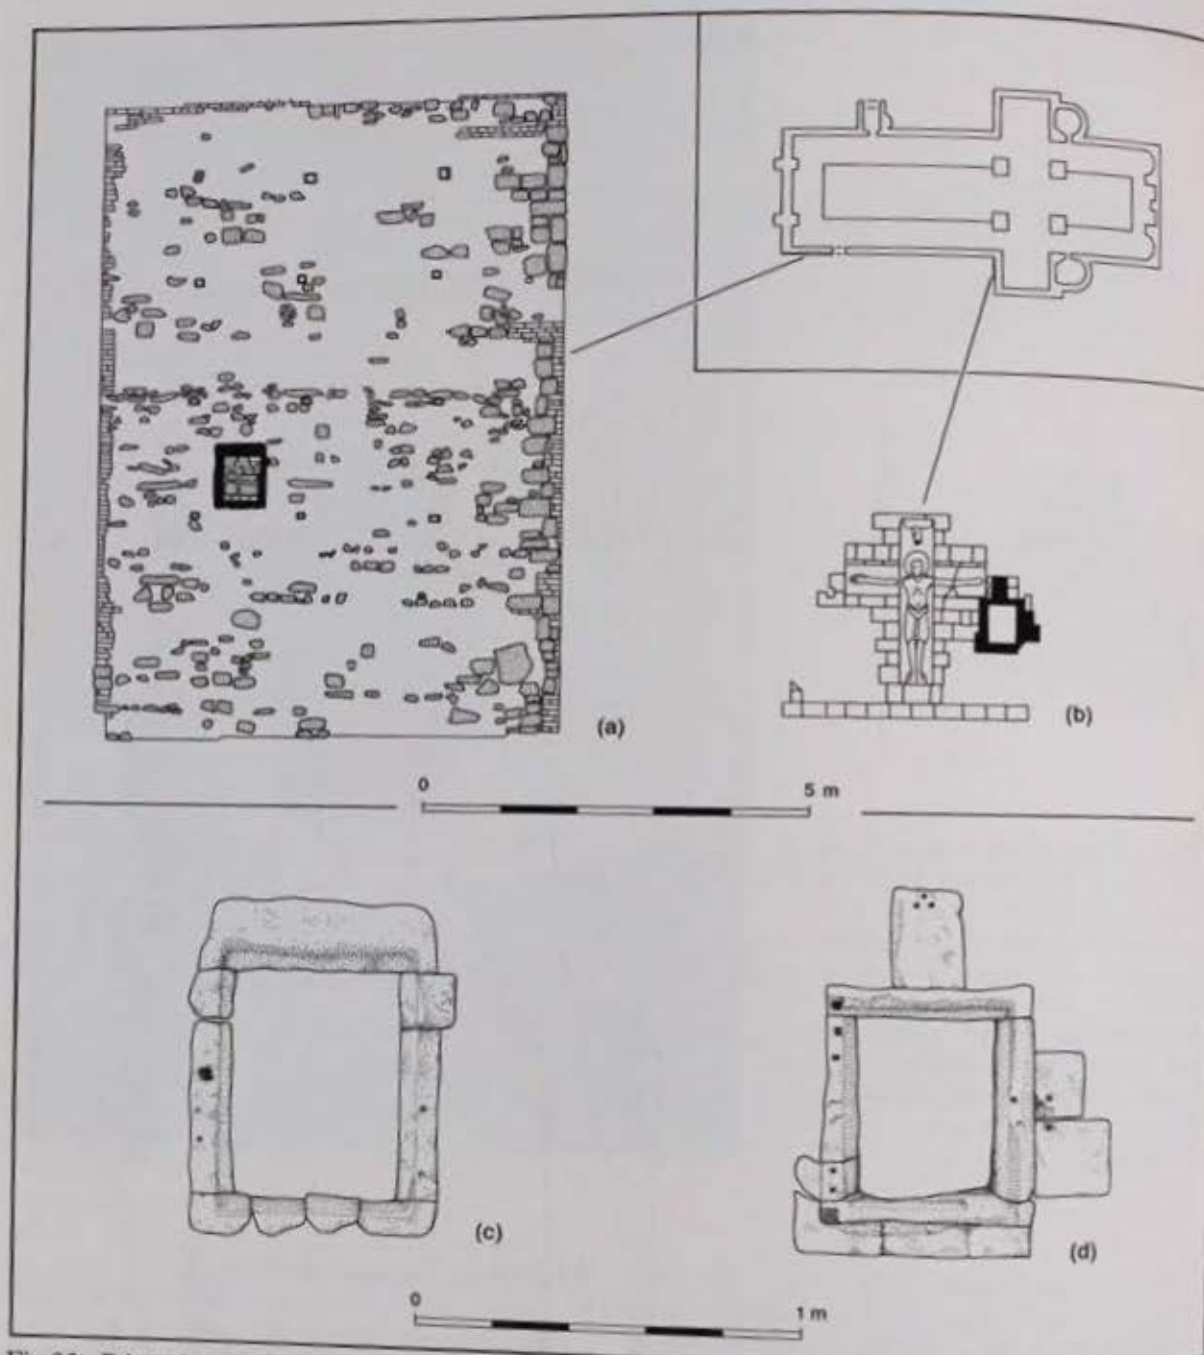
RA 1977 and 1986: a) Flint rubble wall of Bay 7 of south nave aisle, with putlog holes and stone cupboard indicated. b) Saxon rood and associated stone cupboard on west wall of south transept. c) Detail of stone cupboard on (a). d) Detail of stone cupboard on (b).
